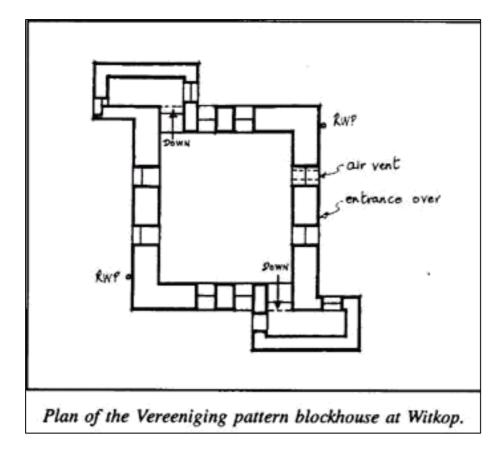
Plan of a Vereeniging pattern blockhouse.
